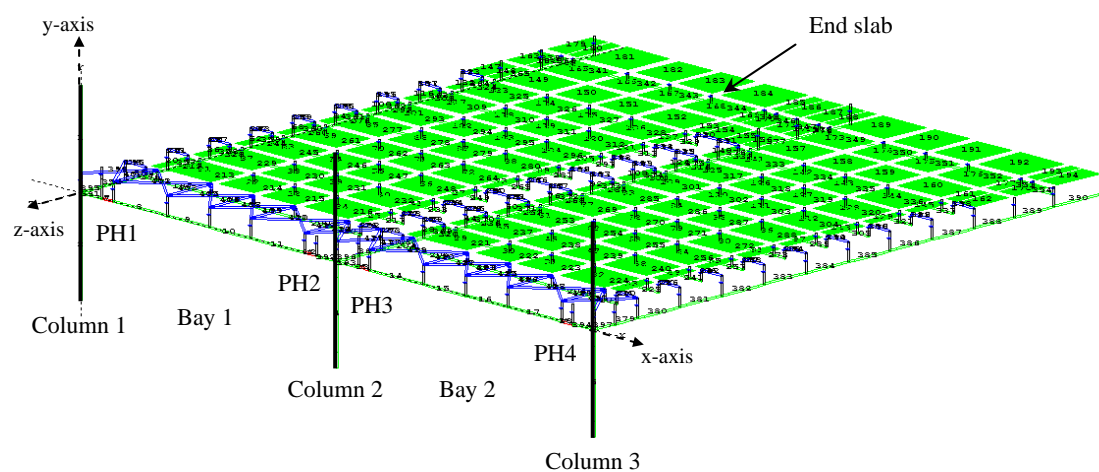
Layout of the 2-bay perimeter frame-floor model with the slab reinforcement being halved
